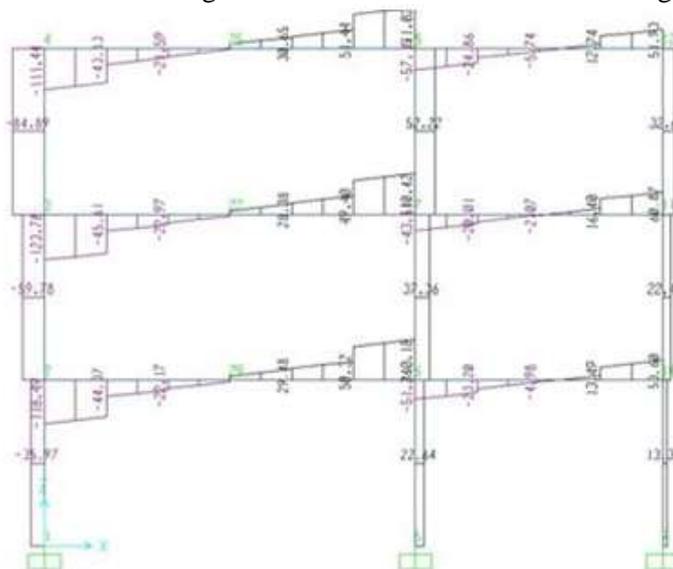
Shear of beam and column (Max 123.78 KN)
